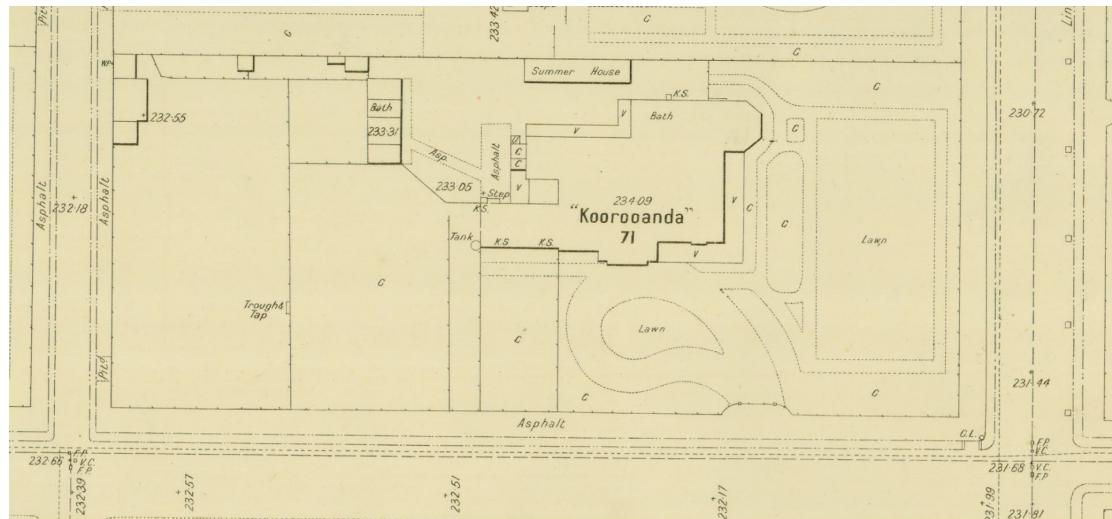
The original residence at 53 Walpole Street, Kew (formerly addressed as 71 Malmsbury Street), shown in MMBW Detail Plan No. 1583, dated 1904. The house 'Kooroonda' was set on a large block with generous areas of garden to the south and east. (Source: State Library Victoria)
